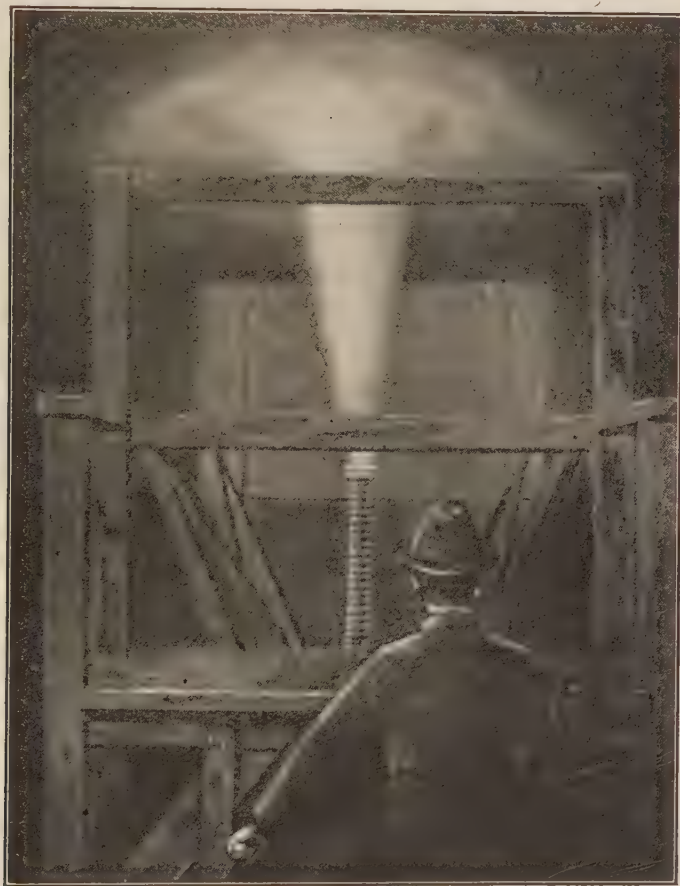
PLACING STEAM-JETTED CONCRETE ON TUNNEL ROOF.
